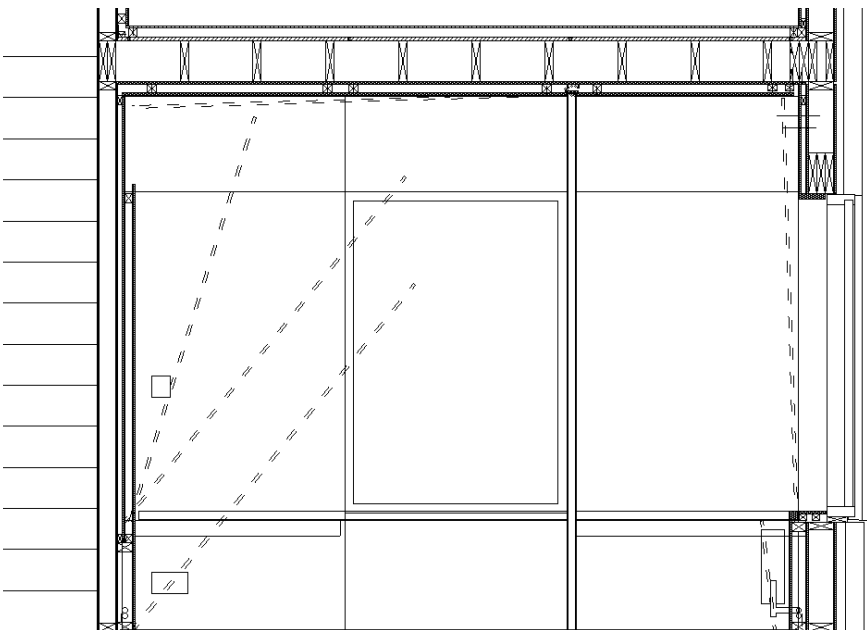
Revised Section with hinged wall panels to facilitate service maintenance and changes (Walsh 2021)
